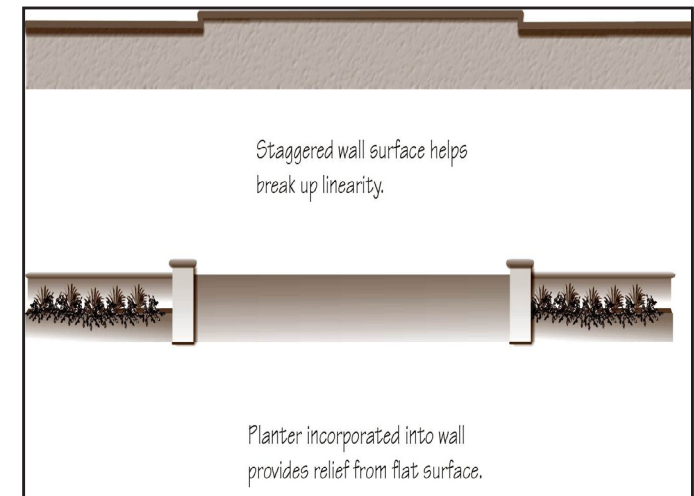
Long expanses of walls should be interrupted with landscaping, pilasters or changes in height
